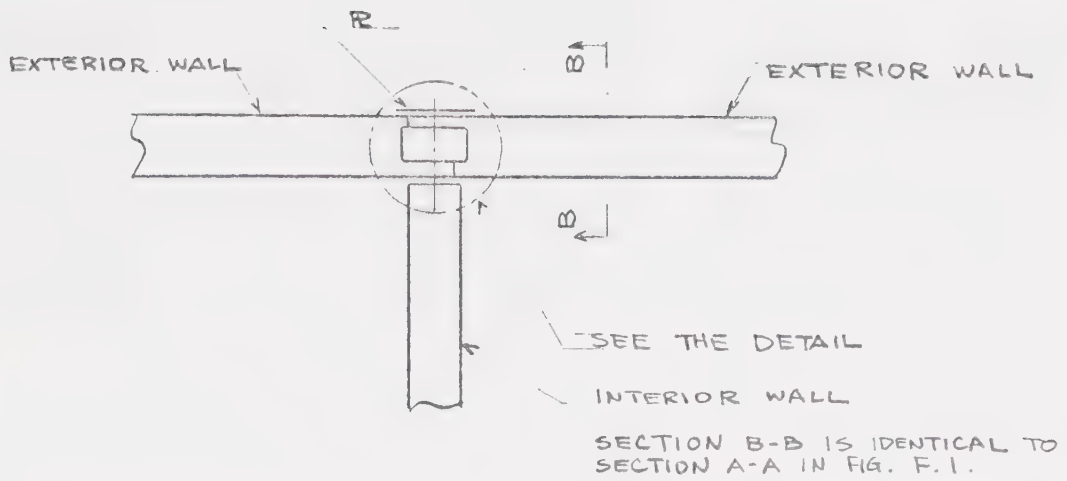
THE CORNER CONNECTION FOR INTERIOR WALL PANELS
